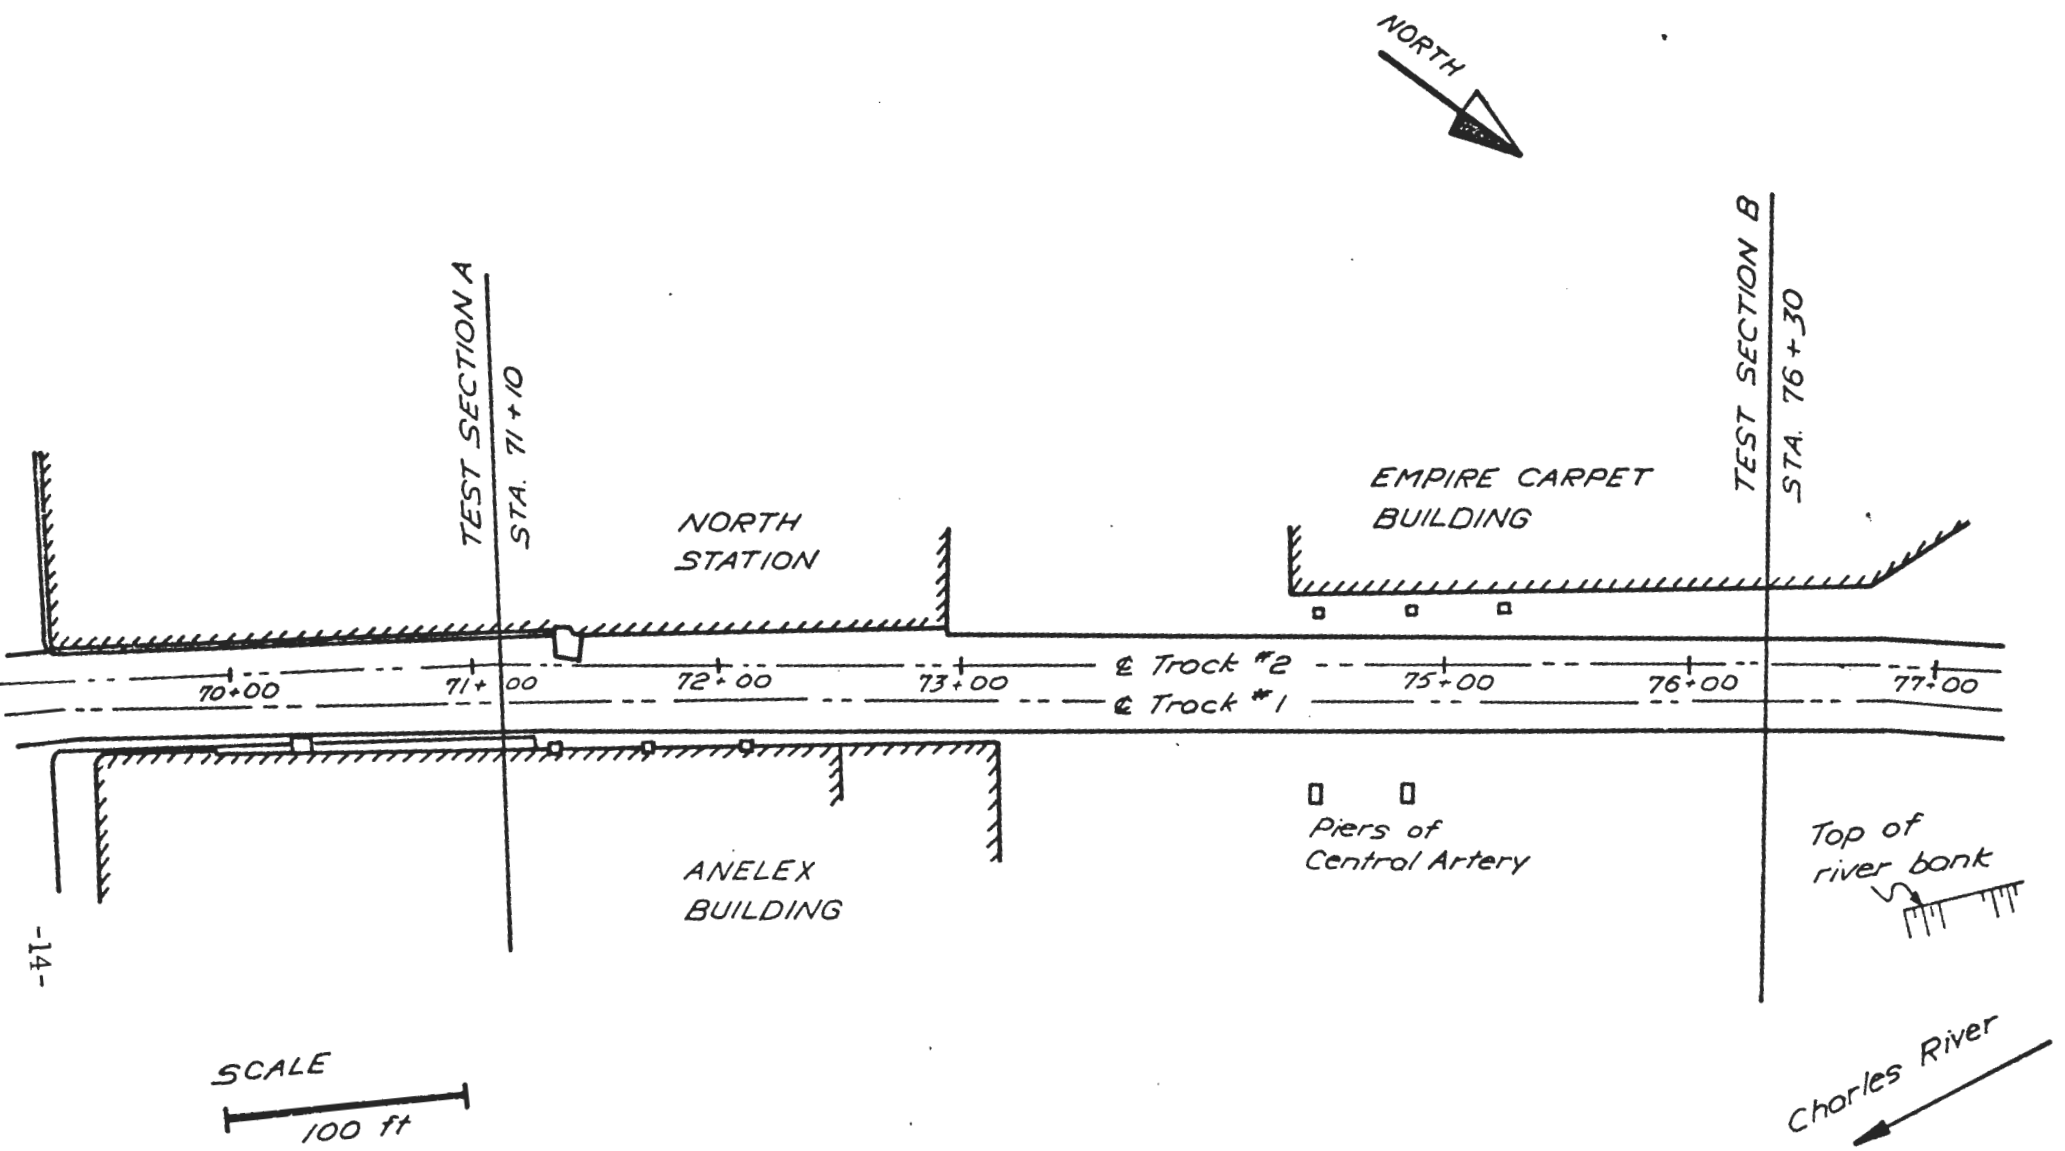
PLAN VIEW OF SUBWAY EXTENSION
